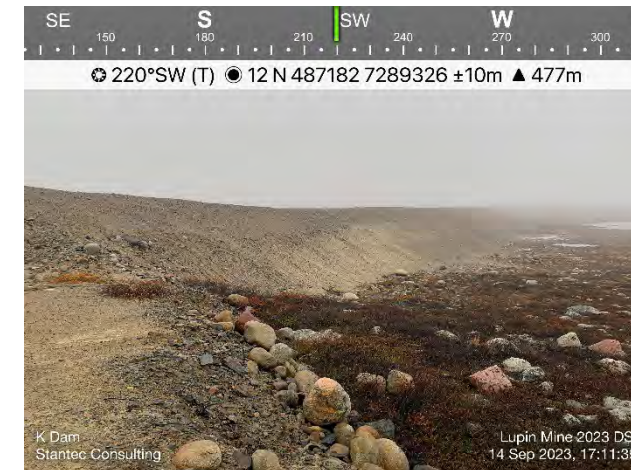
Overview of the K Dam downstream embankment and toe area as viewed from near its right (NE) abutment.
